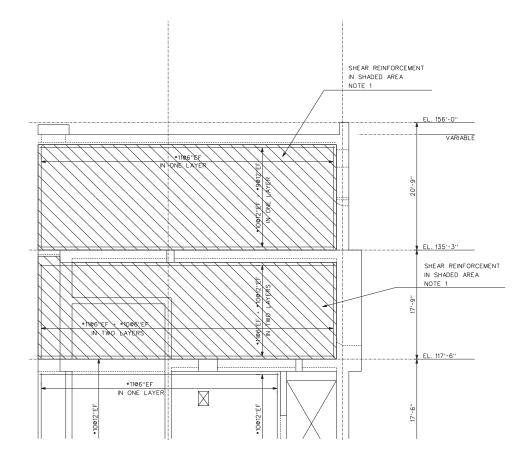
H.5-11 (Sheet 4 of 6) [Design of Shield Building at Air Inlets]
